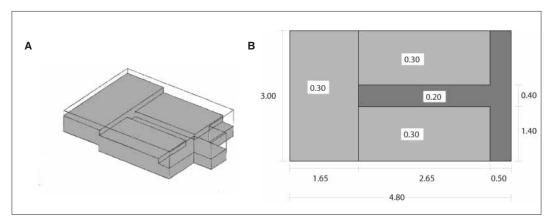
Foundations of tapstand and laundry area. A: perspective view. B: plan.
